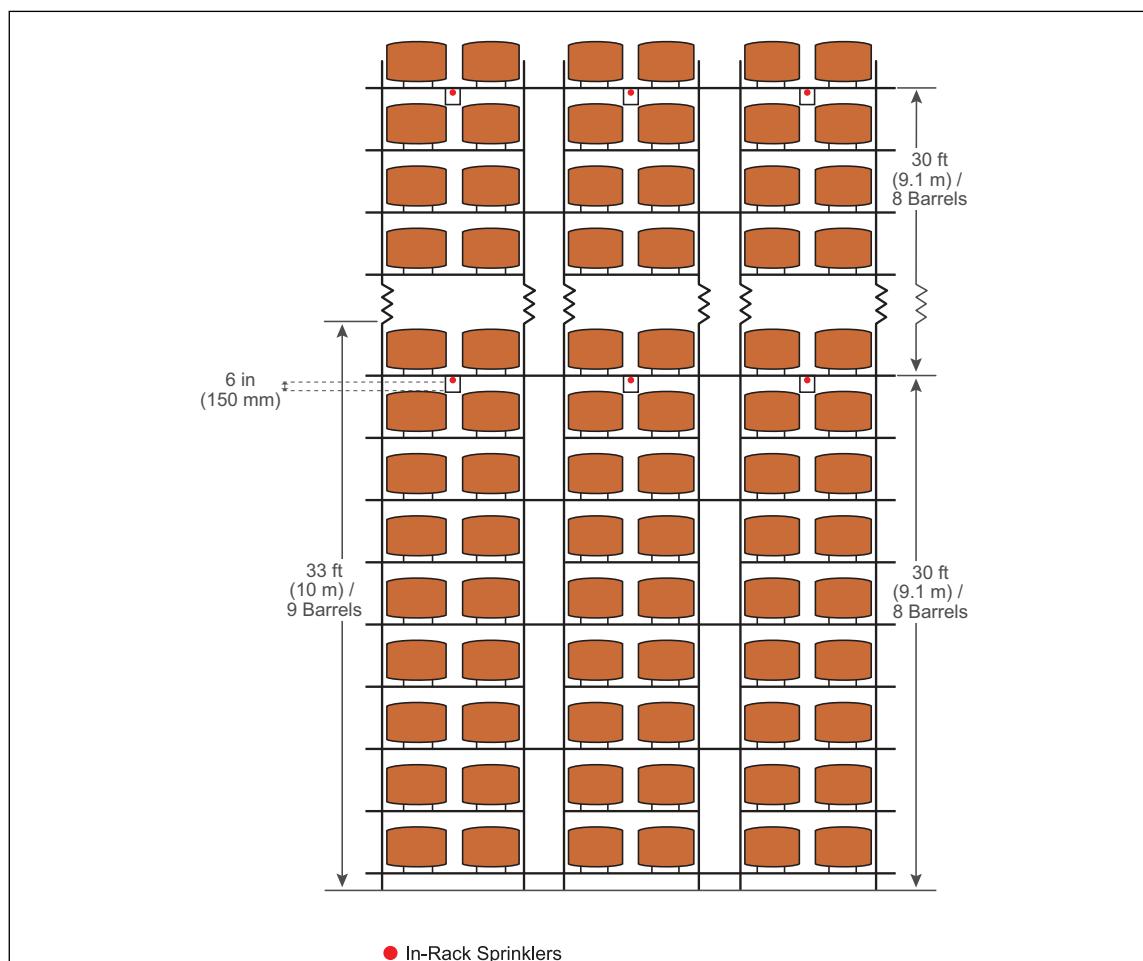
In-rack sprinkler layout for distilled spirits in wooden barrels (elevation view)
